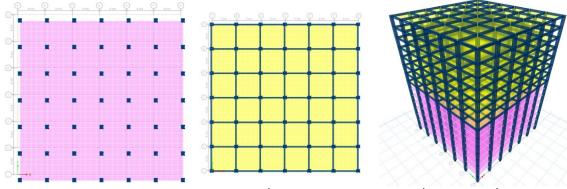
a. Plan view from Ground storey to 7th storey, b. Plan view from 8th storey to 15th storey and c. Elevation view of model FS+CS
